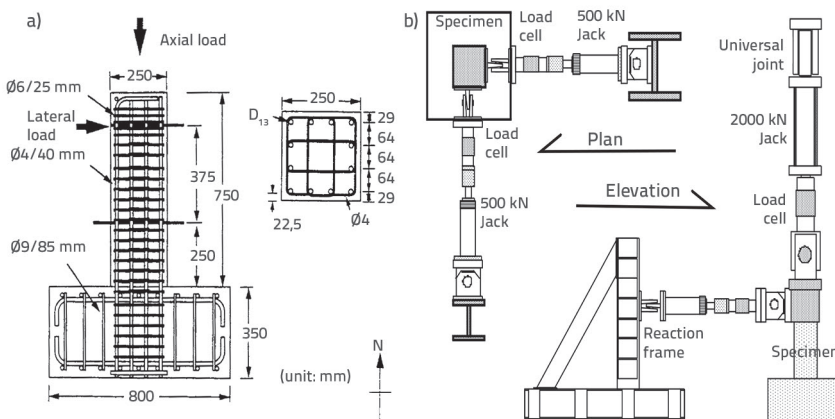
Specimen dimensions and loading system for small specimens [17, 18]: a) Reinforcement configurations; b) Loading system
